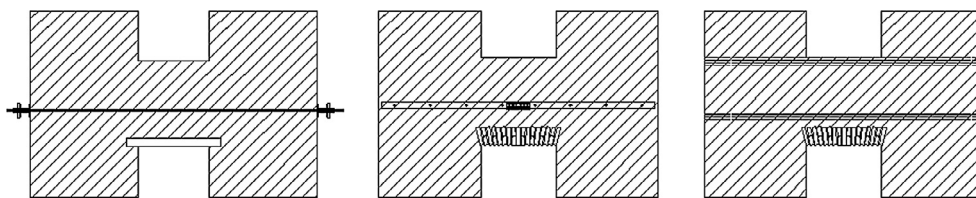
Spandrel specimen reinforced with steel ties (left, a), with steel beam (centre, b) and with CFRP laminates (right, c).
